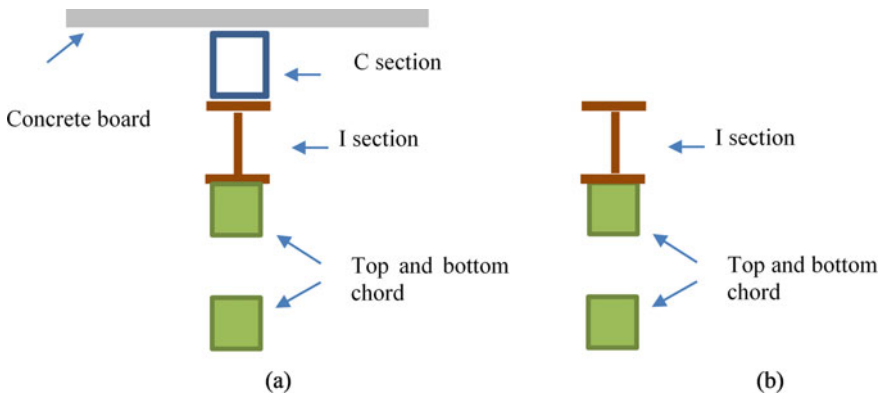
a Truss joist model 9500 mm long, b truss girder model 3750 mm long
